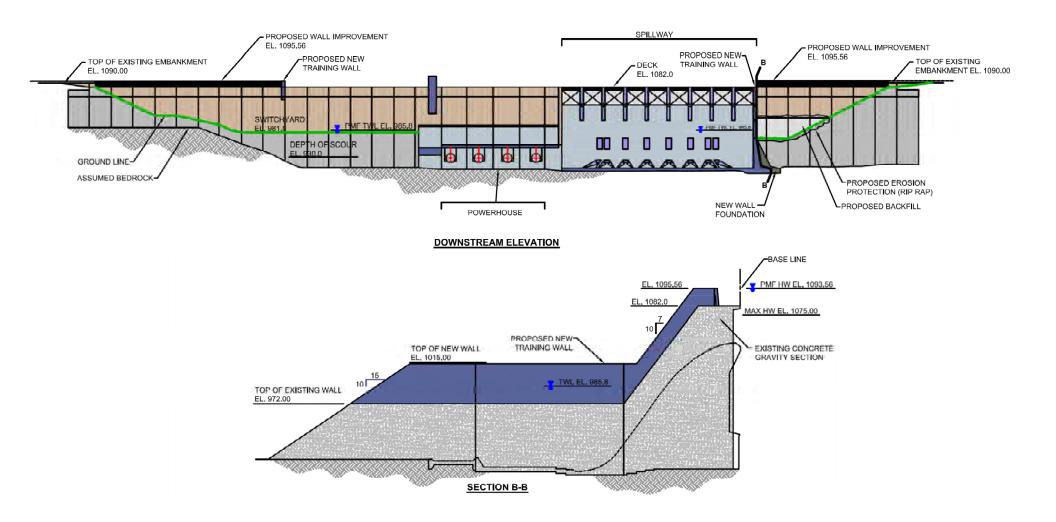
Central Concrete Portion Concept for Cherokee Dam
